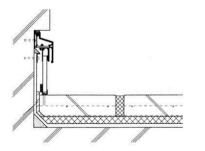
Standerd Detail around Asphalt Roofing. (Japan)[14]
